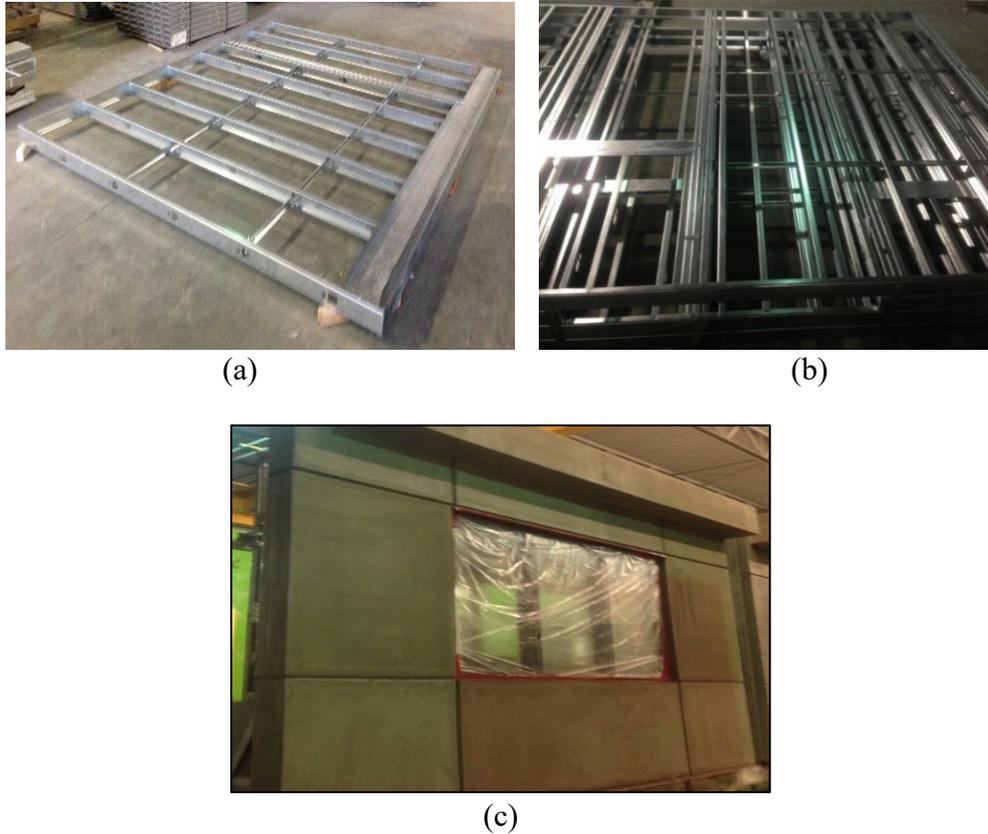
Different types of wall panels: (a) Interior wall panel; (b) Interior wall panel with door; and (c) Exterior wall panel with window
